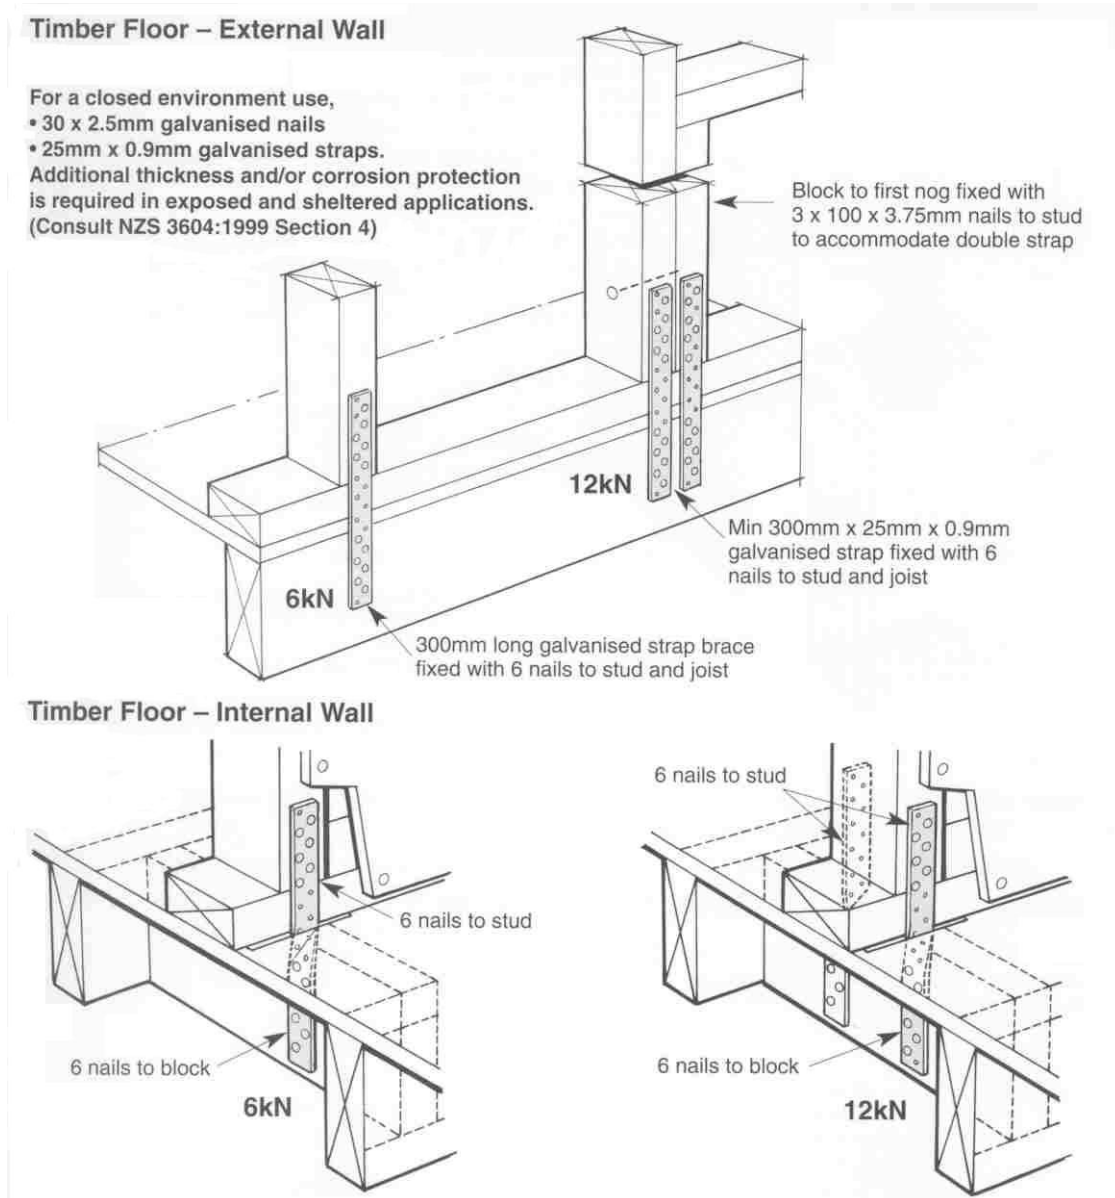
6 kN hold-down straps for bracing walls on a timber foundation (printed with permission from Winstone Wallboards).
